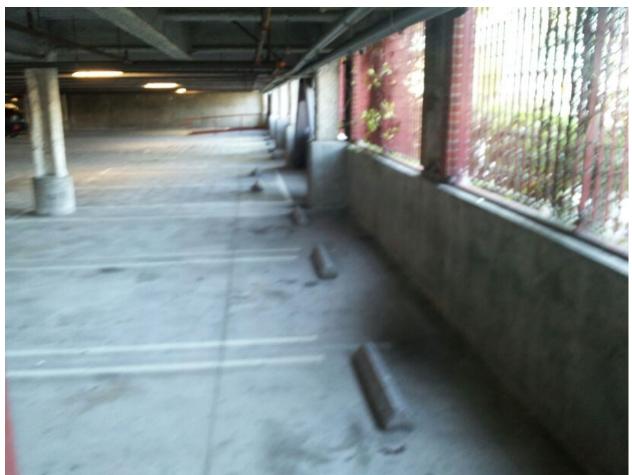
Full garage level view; photo taken facing north from southern boundary of site. Peladeau Street is located on the right of the picture adjacent to the visible landscaping.
